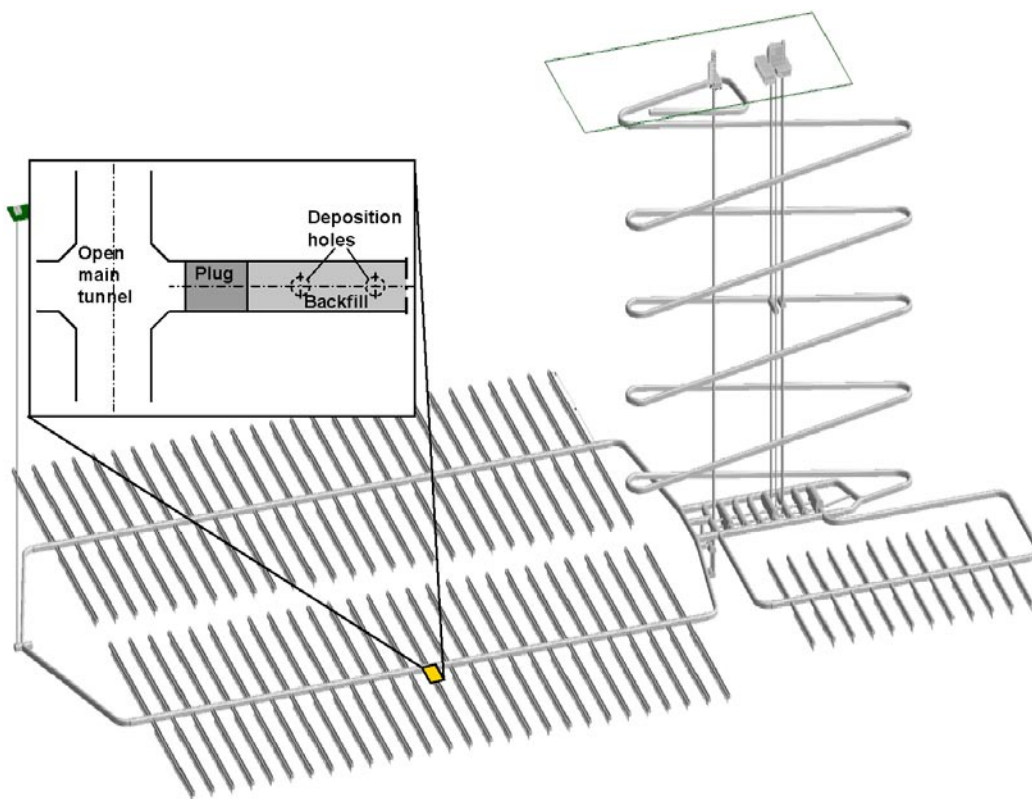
Schematic figure of a general repository layout. The close-up shows a principle sketch of a horizontal section of the deposition tunnel-main tunnel intersection with a plug installed.
